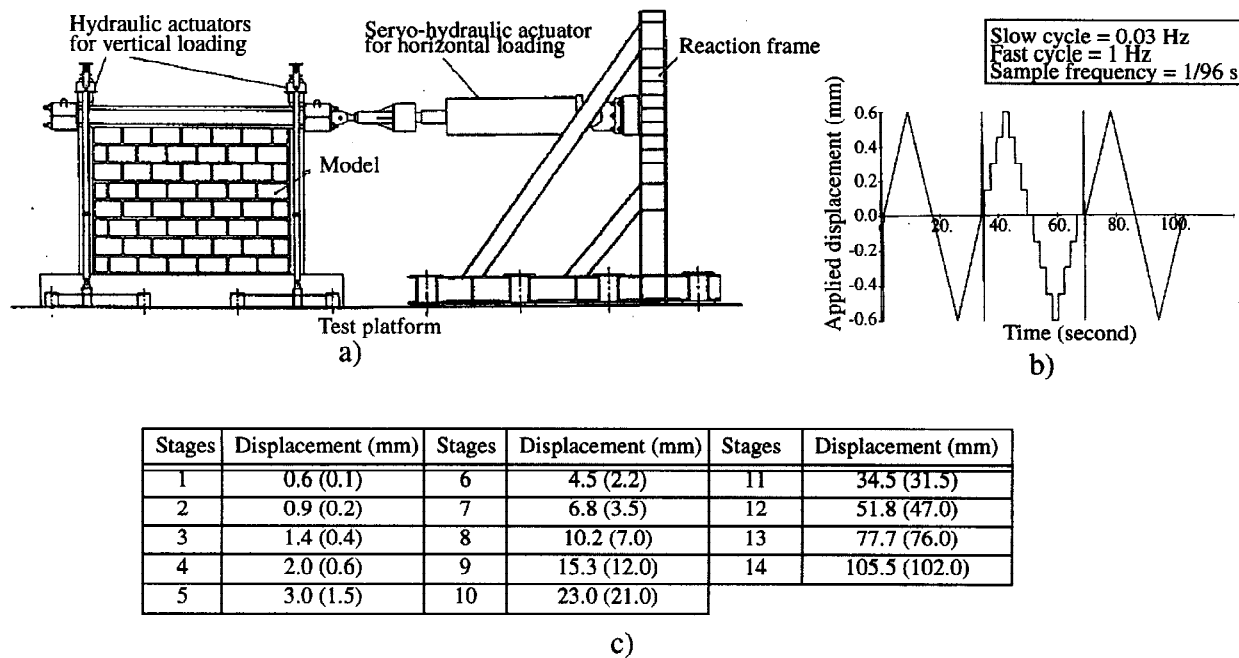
Tests description: a) Experimental set-up, b) Loading history for the 1st stage and c) Amplitude of each stage
